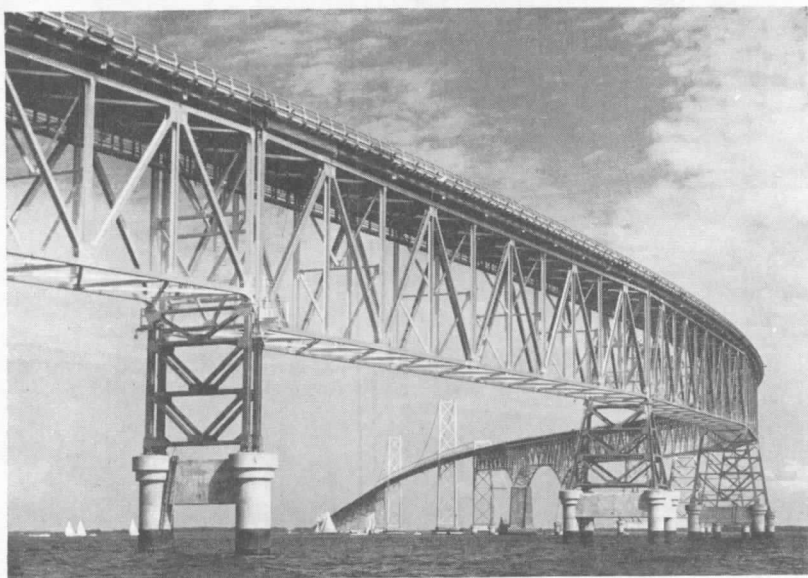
Chesapeake Bay Bridge (Photograph by M. E. Warren)
